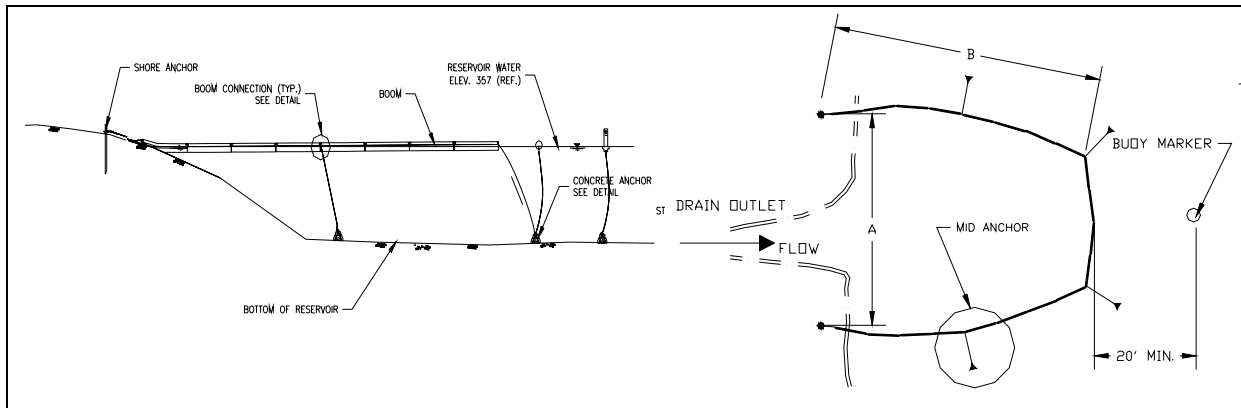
Spill Containment Boom - Plan and Cross Sectional Views.
